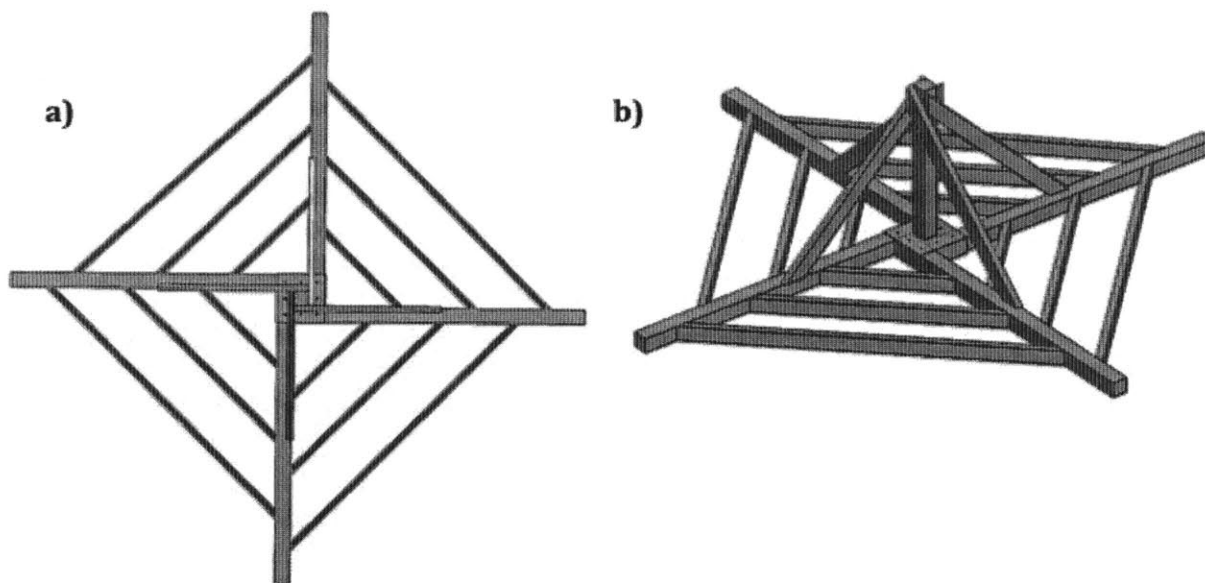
Swing arm bracing beams; top-down view in (a). The central cantilever beam case is visible in (b).
